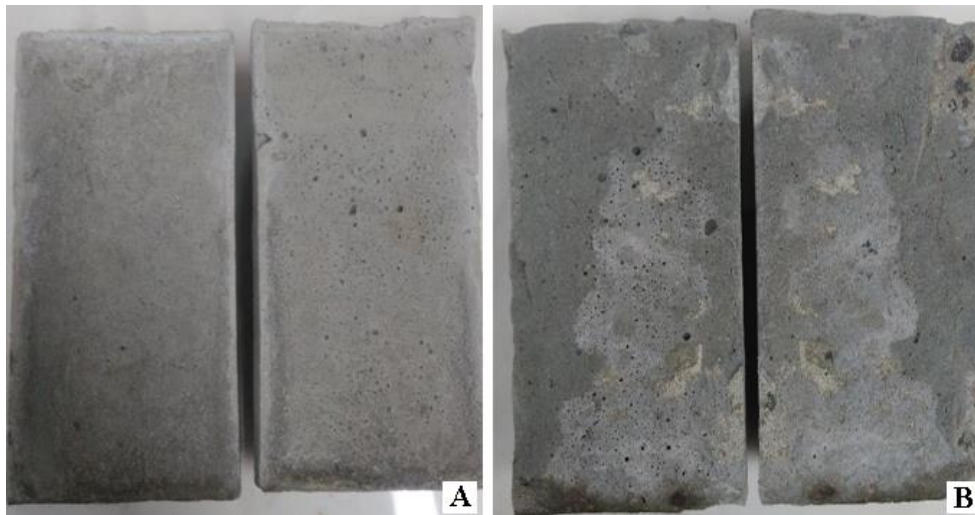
(A) Plan of rupture of a test specimen tested in adhesion without an adhesion bridge; (B) Plan of rupture of a test specimen tested in adhesion with an adhesion bridge.
